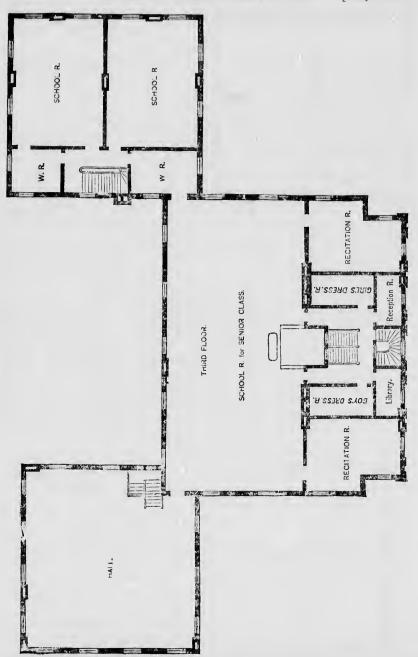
Plan of the Third Floor, adapted to Fig. 221.
